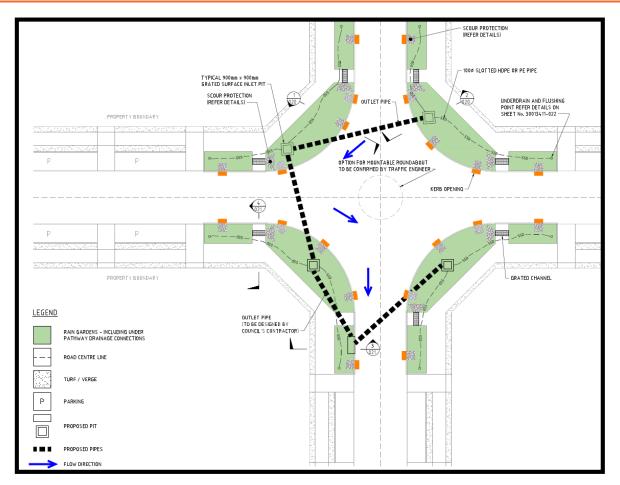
Raingarden General Arrangement at Intersection (SMEC 2021)
